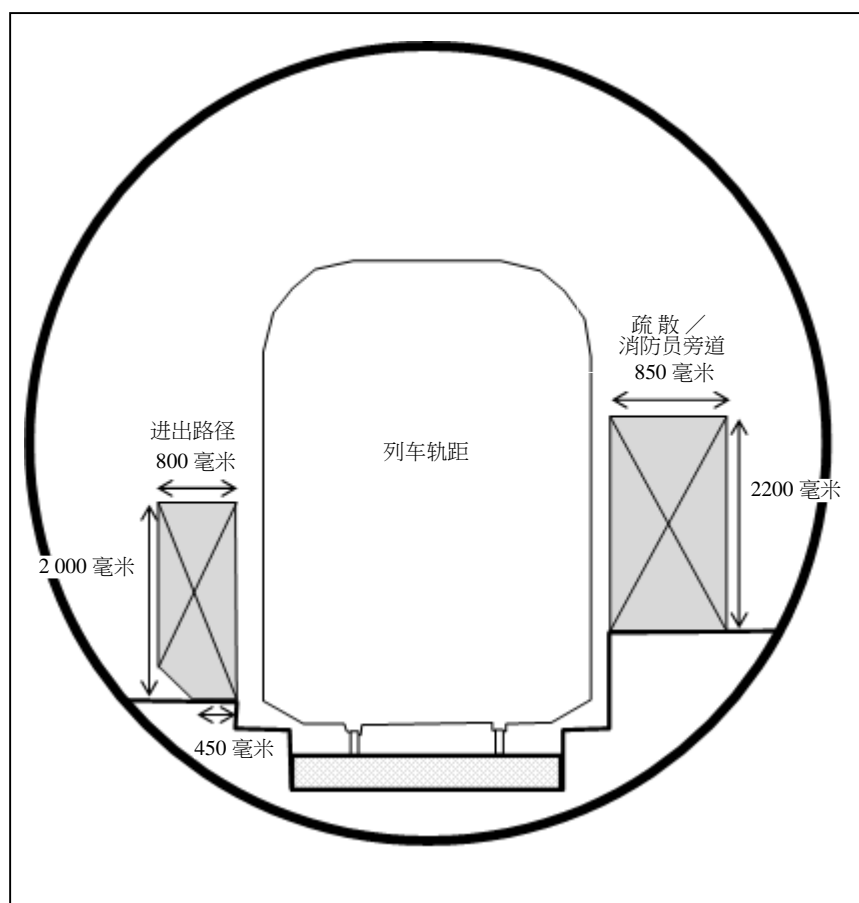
Tunnel evacuation/fireman's side walkway and access space
